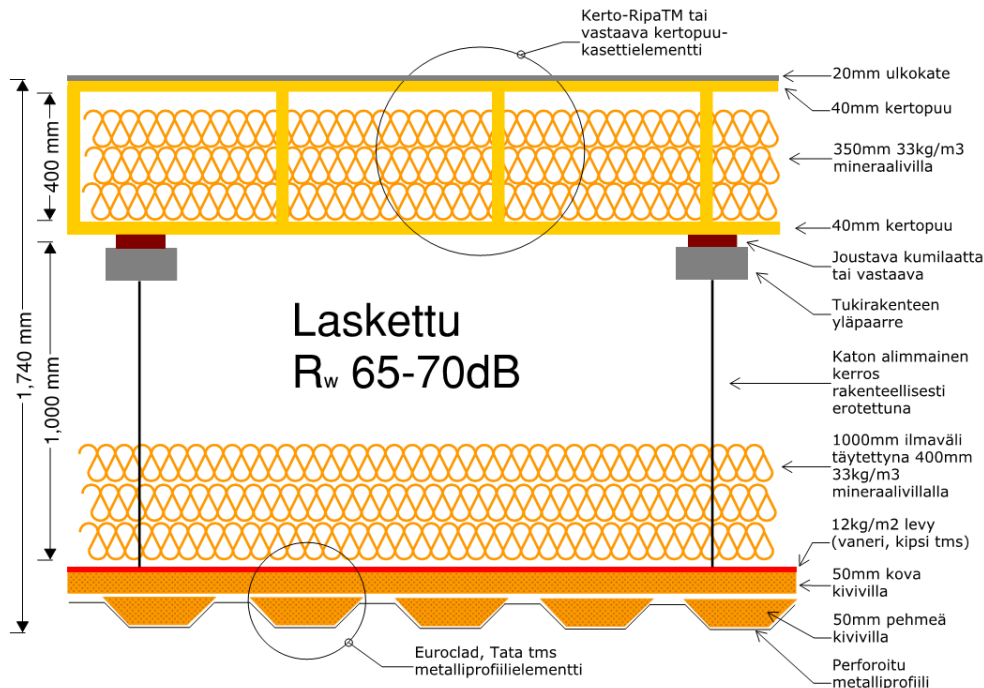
Roof build-up sketch drawn at the competition stage of the project.
